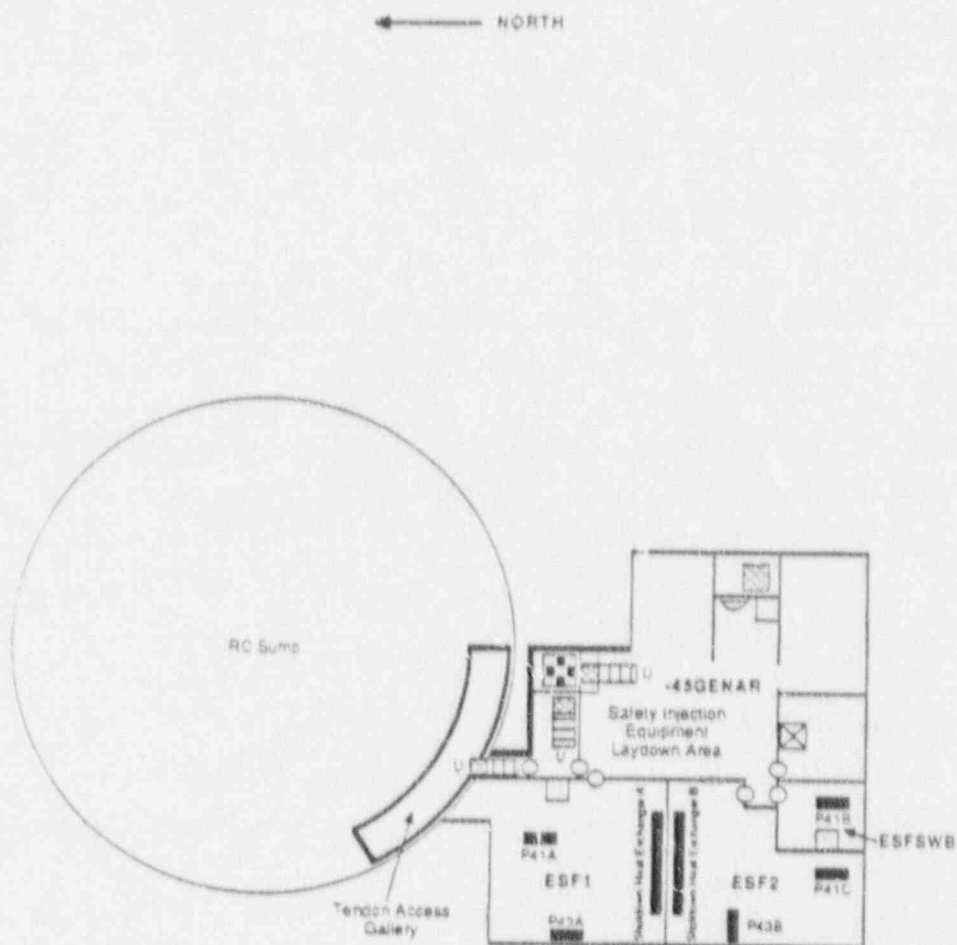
Millstone 2 Containment and Auxiliary Buildings, Elevation -45' 6"
